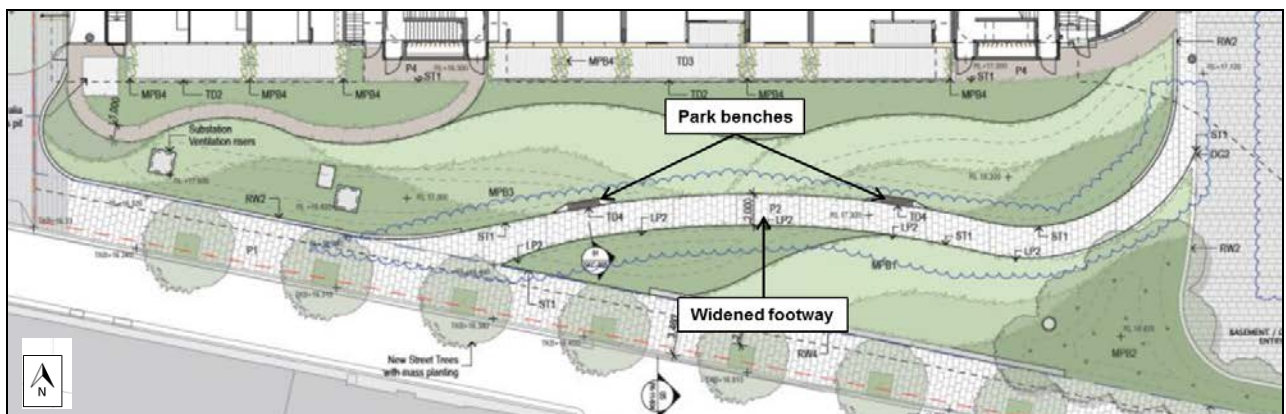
Proposed O'Connor Street park layout (Base source: applicant's RtS)
